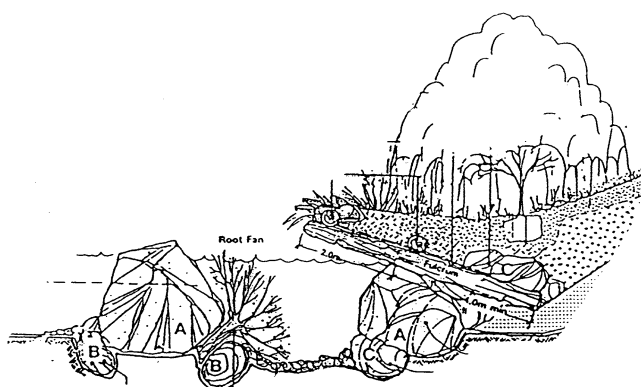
Timber (CANTILEVER) to provide habitat and shade.
